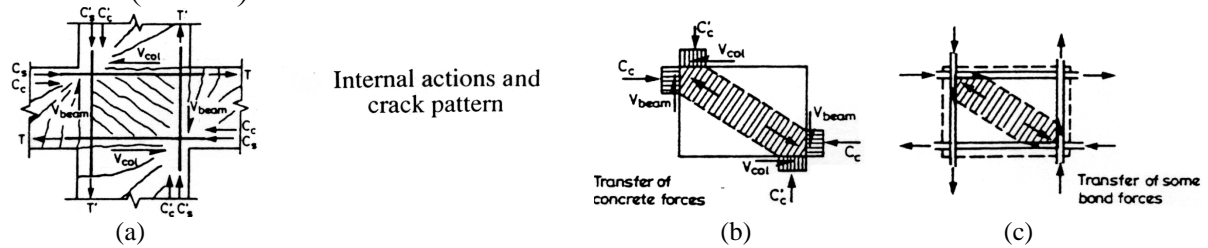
(a) Joint cracking, (b) Strut mechanism, (c) Truss mechanism
